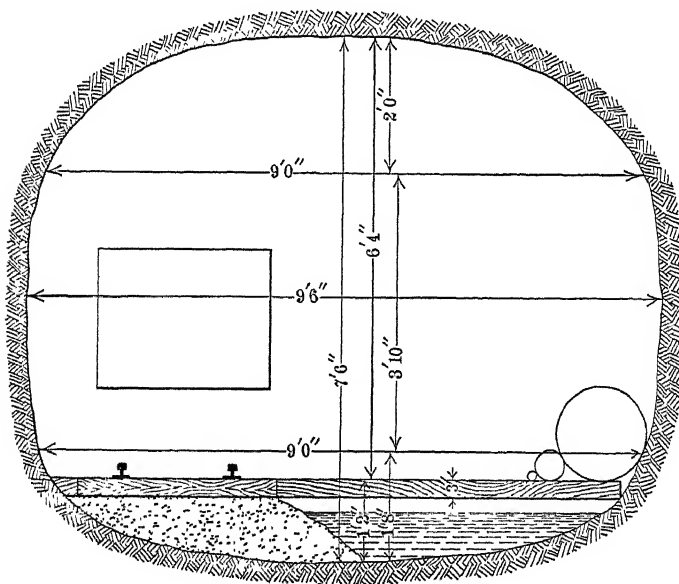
CROSS-SECTION OF THE LARAMIE RIVER TUNNEL, SHOWING POSITION OF TRACKS, DRAIN, VENTILATING, COMPRESSED-AIR AND WATER-PIPES.
